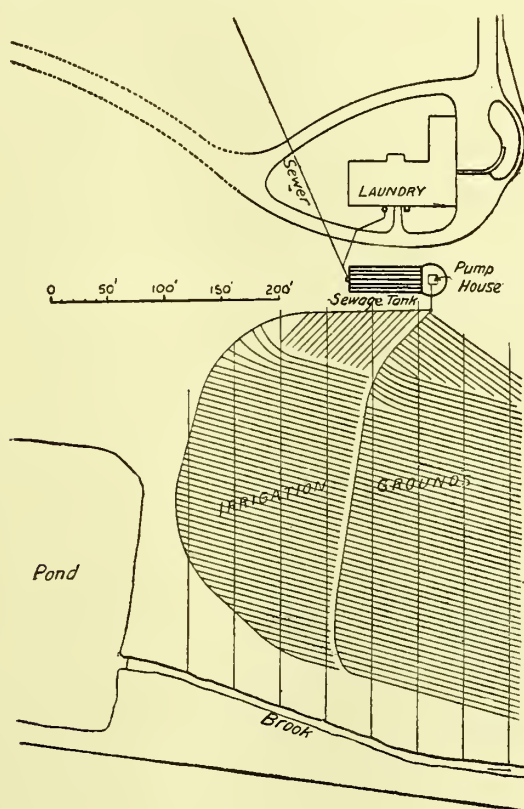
PLAN OF DISPOSAL WORKS, LAWRENCEVILLE SCHOOL.
